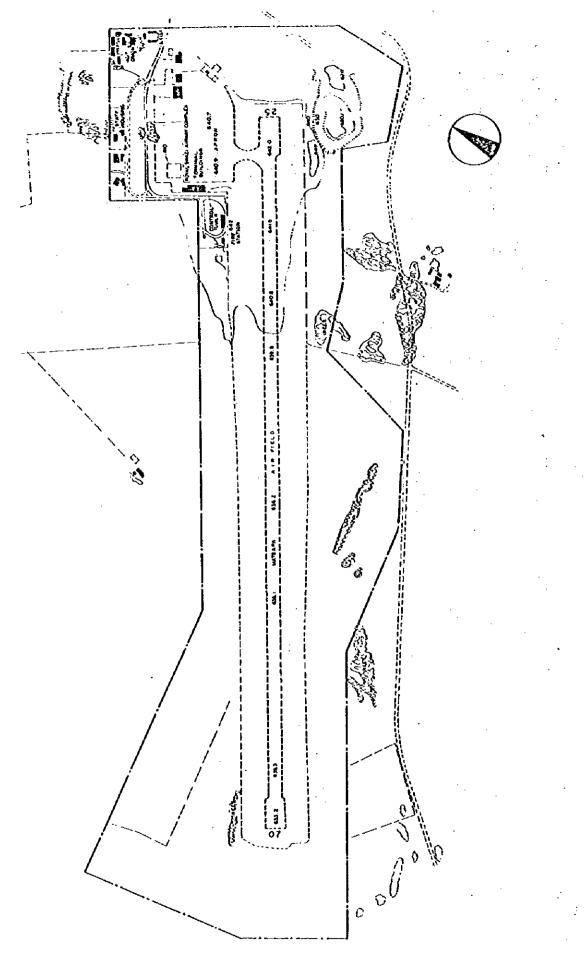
MATSAPA AIRPORT LAYOUT PLAN 2-20
